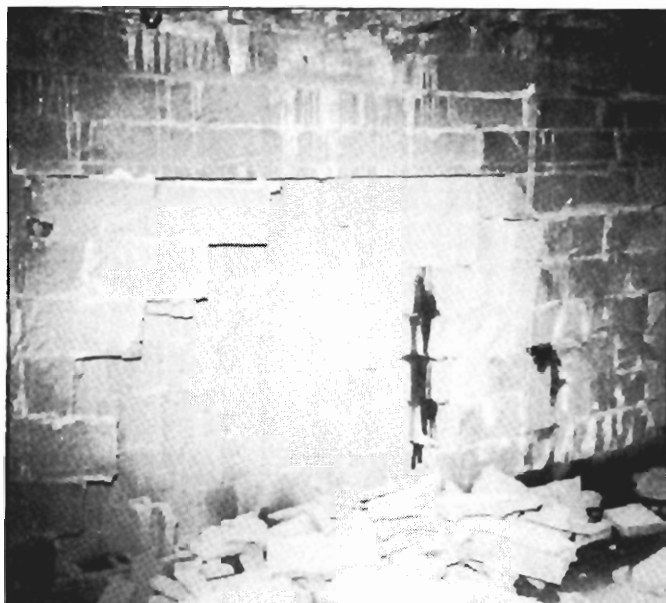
Condition of the 46-cm-thick polymer and aggregate core seal design, which withstood a 269-kPa explosion pressure pulse.
